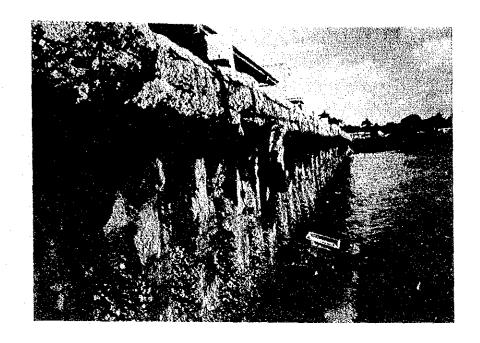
Present Condition of Steel Sheetpile Wall (King's Wharf) under heavy damages
